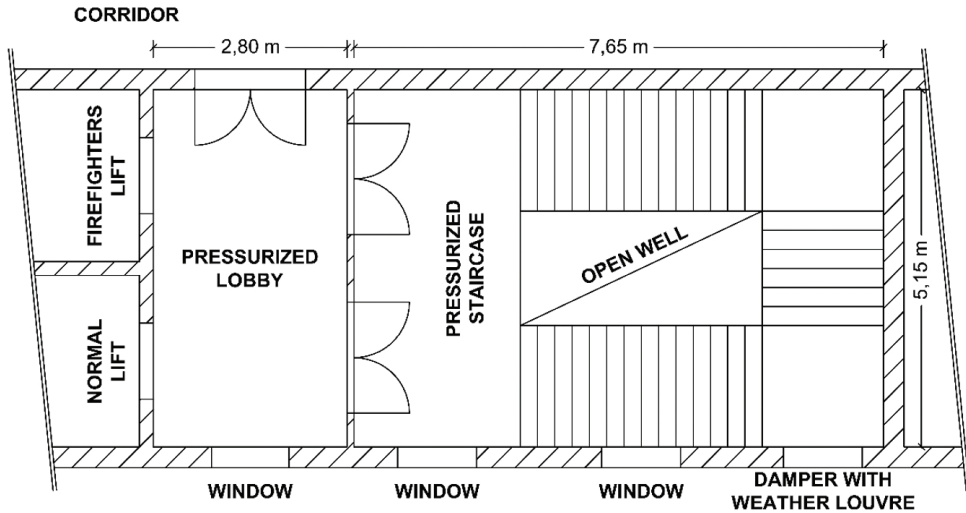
Floorplan of the pressurised stairwell at the 1st floor
